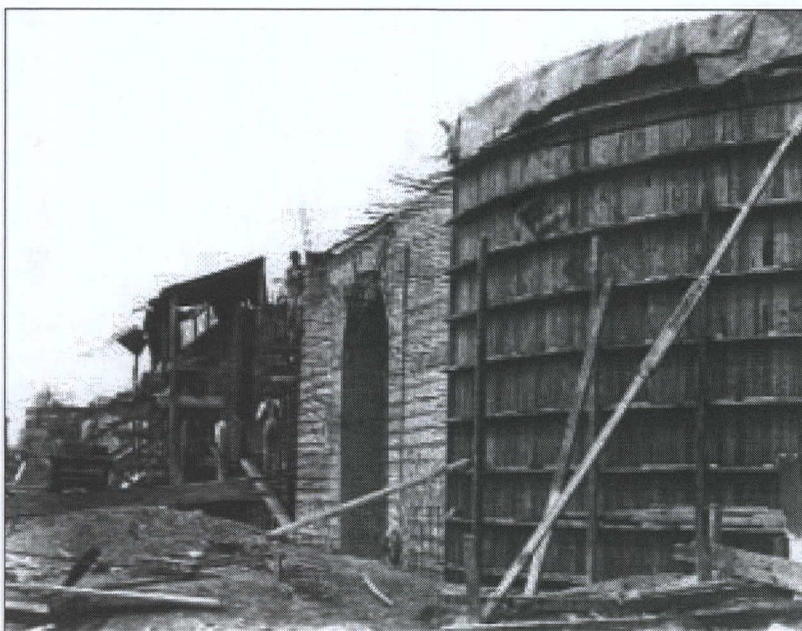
Southeast corner of great wall during construction (RCP-CRF, c. 1929-1930).
